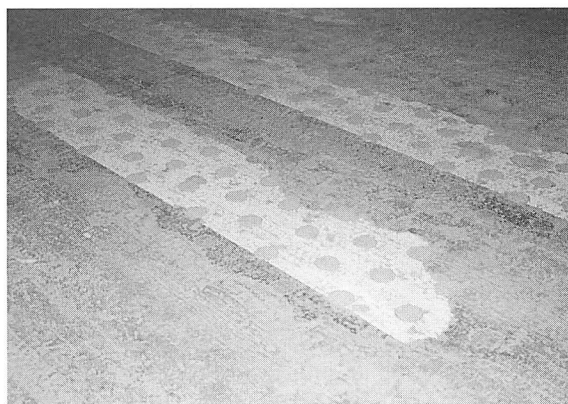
Crossing pavement covered with ice and snow in WEST 4 (Icy condition)
